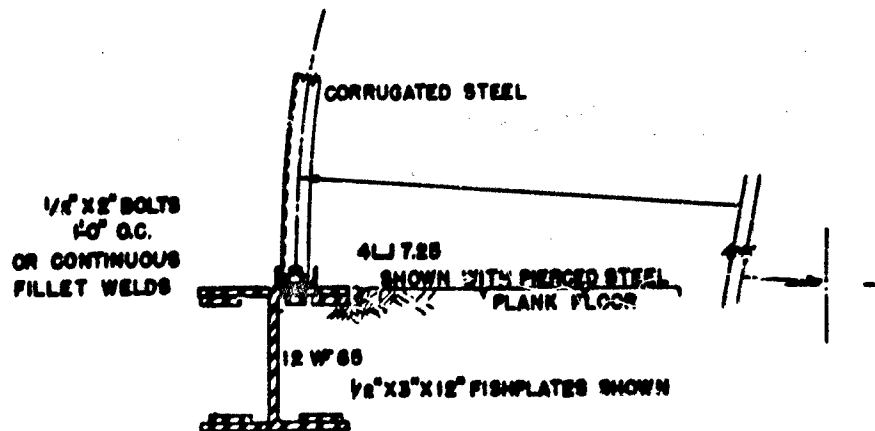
Rolled steel footing for corrugated steel arch structures.
